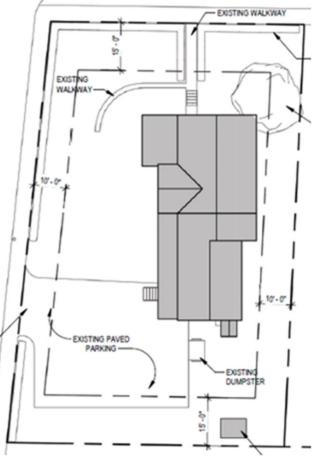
A snippet of the proposed conditions plan for 133 Roxbury St.
